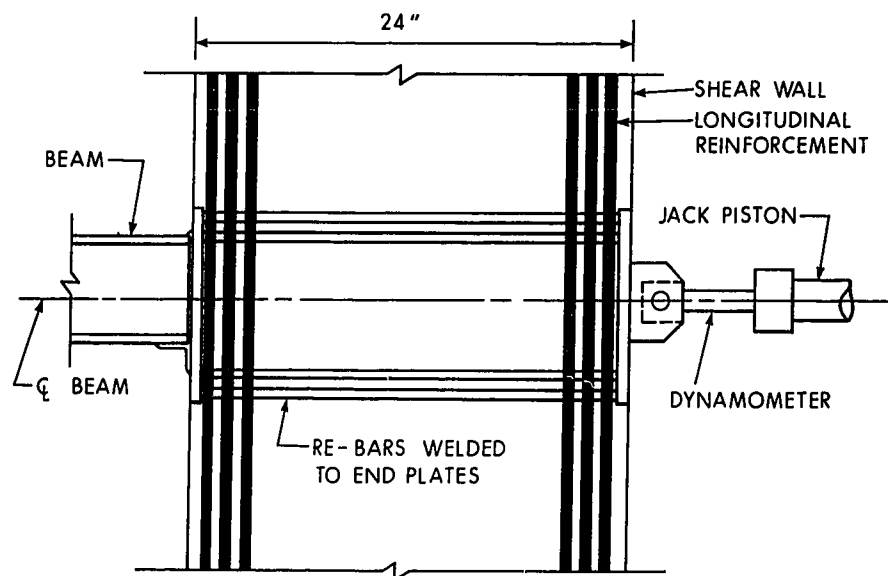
TYPICAL BEAM-TO-WALL JOINT
